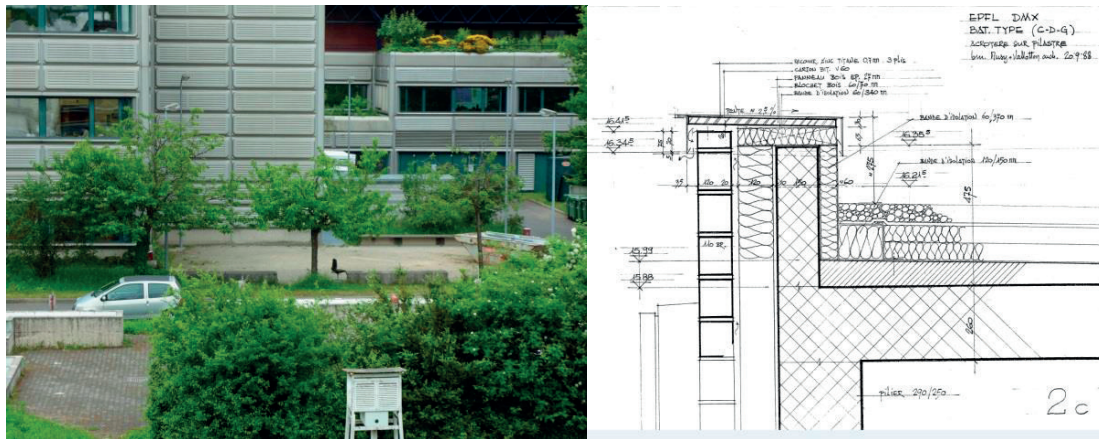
Left: view of buildings of the first stage of construction. Right: constructive detail and section of the facade of building MXD, part of the second stage of construction. Source of the picture on the right: real estate and infrastructure department of the EPFL.
